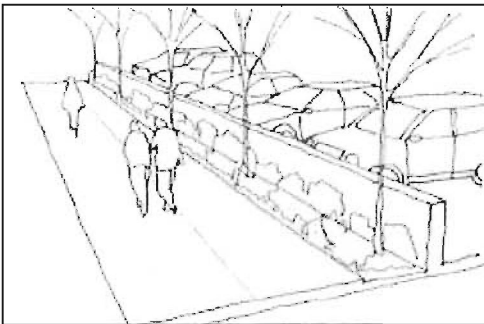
d.2 (2) parking lot landscaping and masonry wall screen
